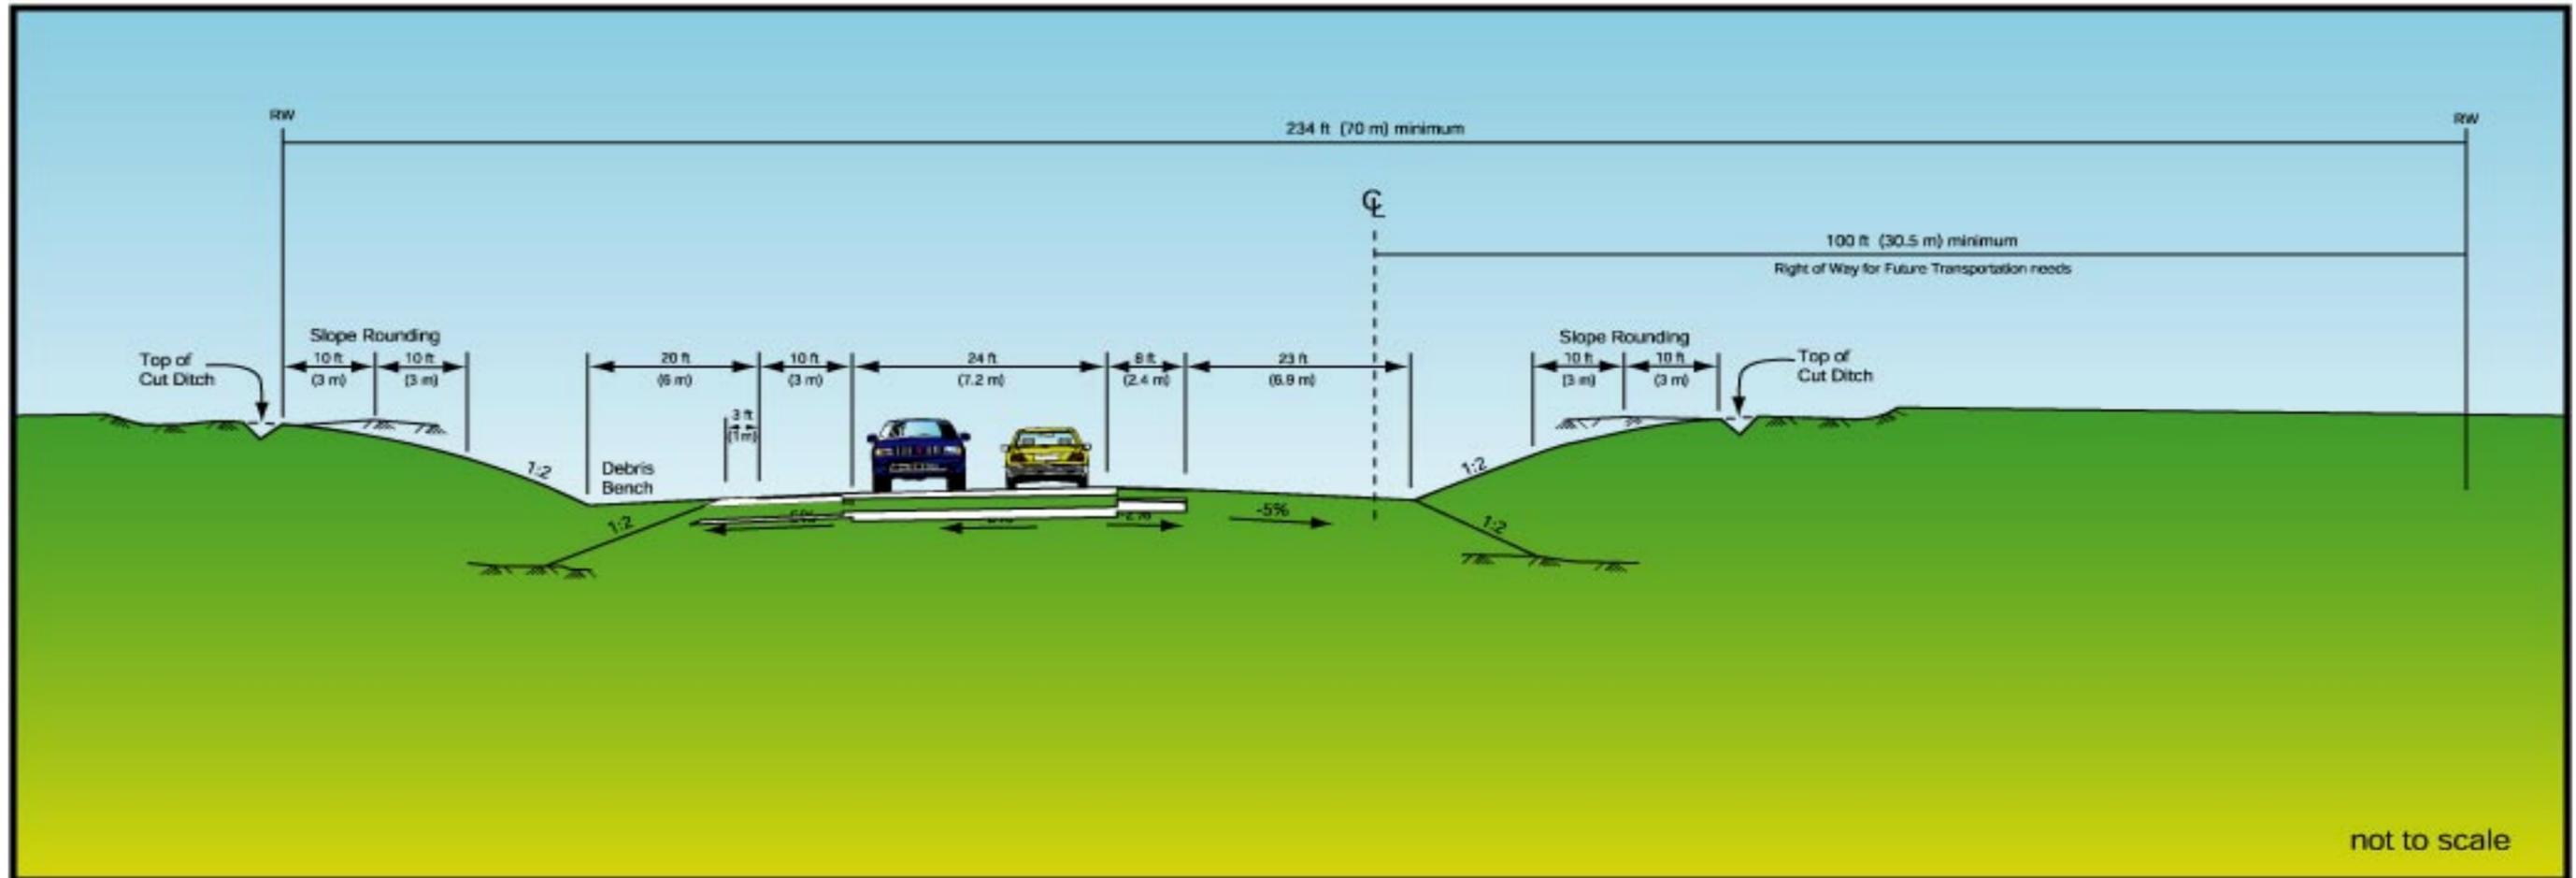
Typical Cross Section of the Two-Lane Expressway
